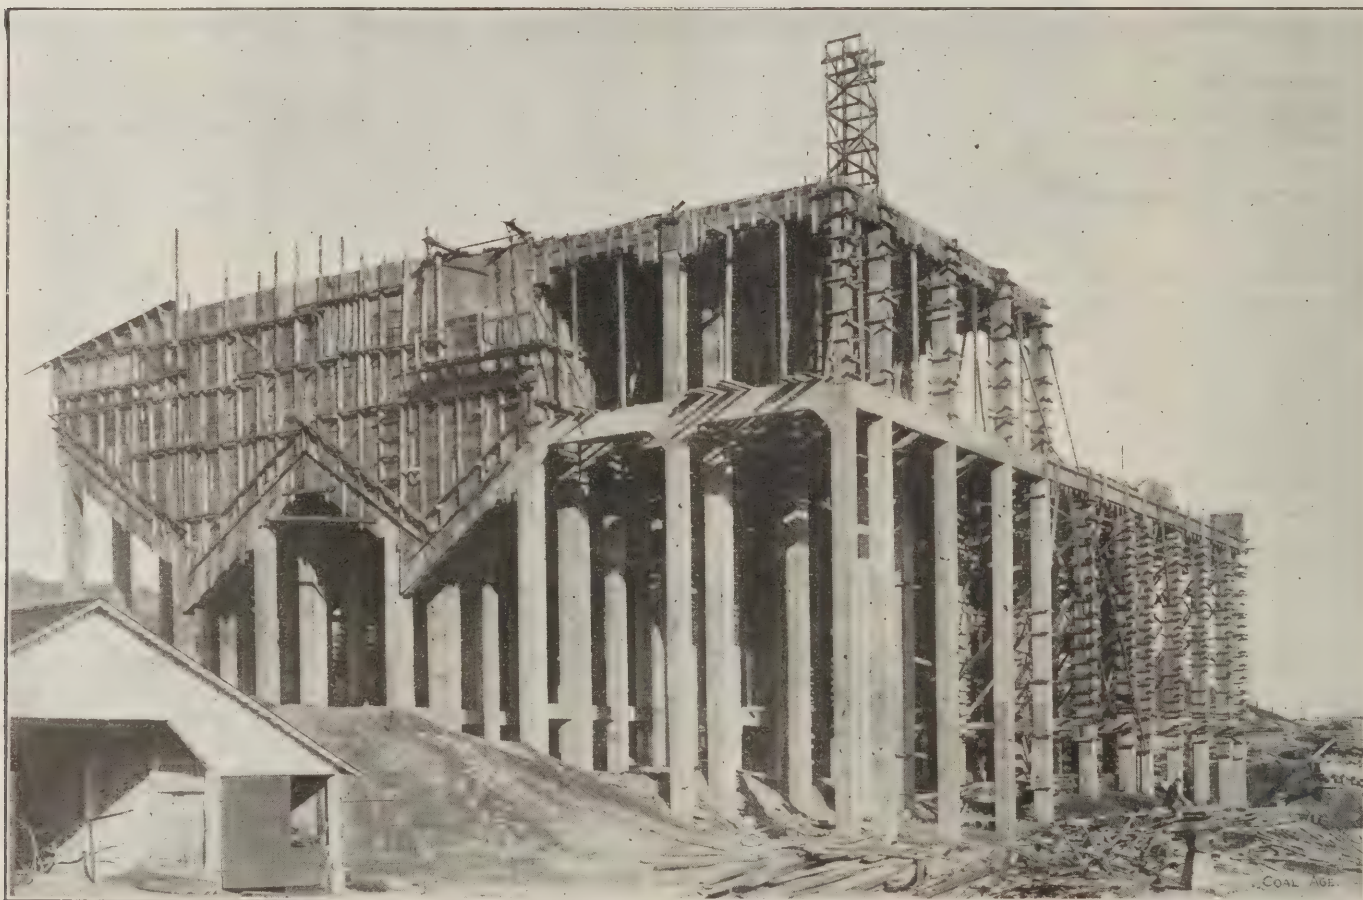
VIEW DURING CONSTRUCTION, SHOWING FORMS FOR CONCRETE
